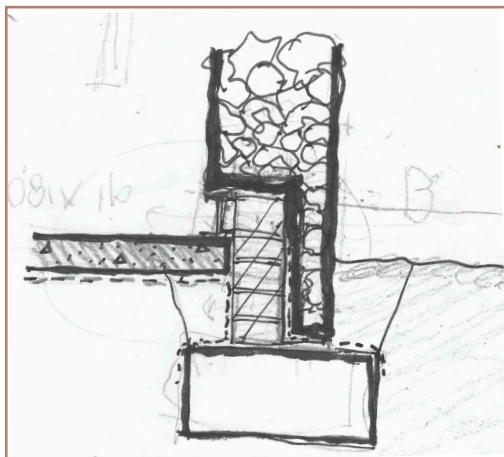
Floor-wall articulation development to achieve a floating wall illusion
